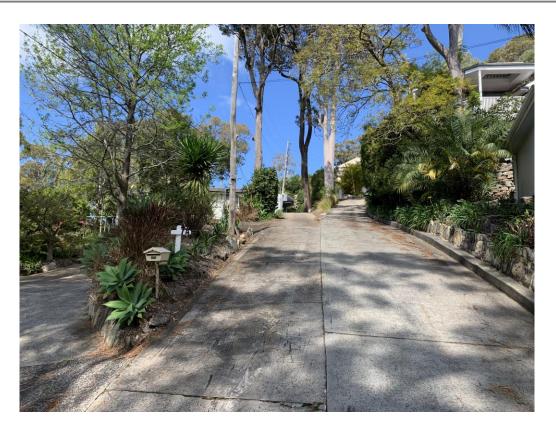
View of common access driveway looking south-east from Loquat Valley Road
